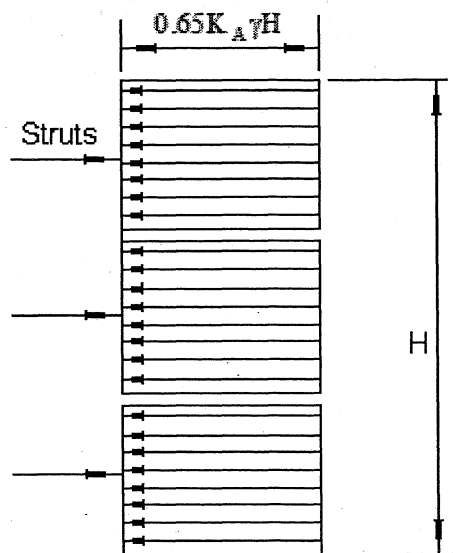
Active pressure diagrams for maximum strut load for braced earth pressure retaining structures in Sand (Figure 37, BS 8002: 1994 – Code of Practice for Earth Retaining Structures).
